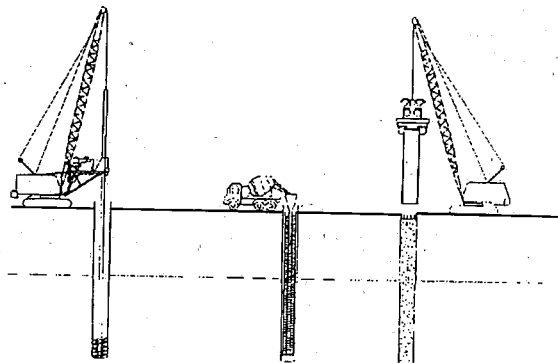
Stages of construction of a rotary bored pile, courtesy of Cementation, Piling and Foundations Ltd.
